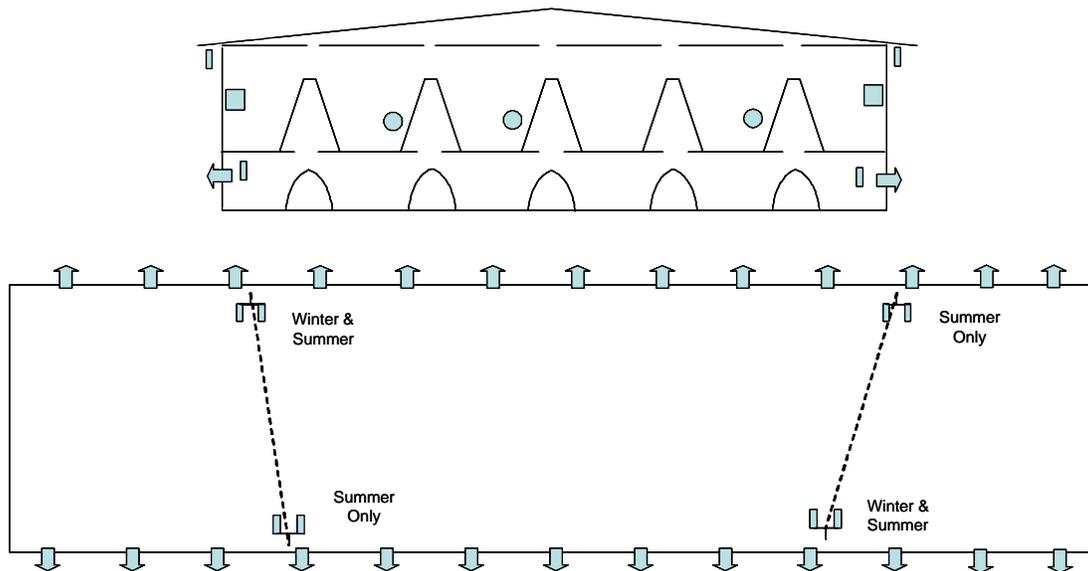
Schematic layout of the IA high-rise layer house showing the cross-section and floor plan of the house and the sampling locations (symbols are the same as in fig. 1).
